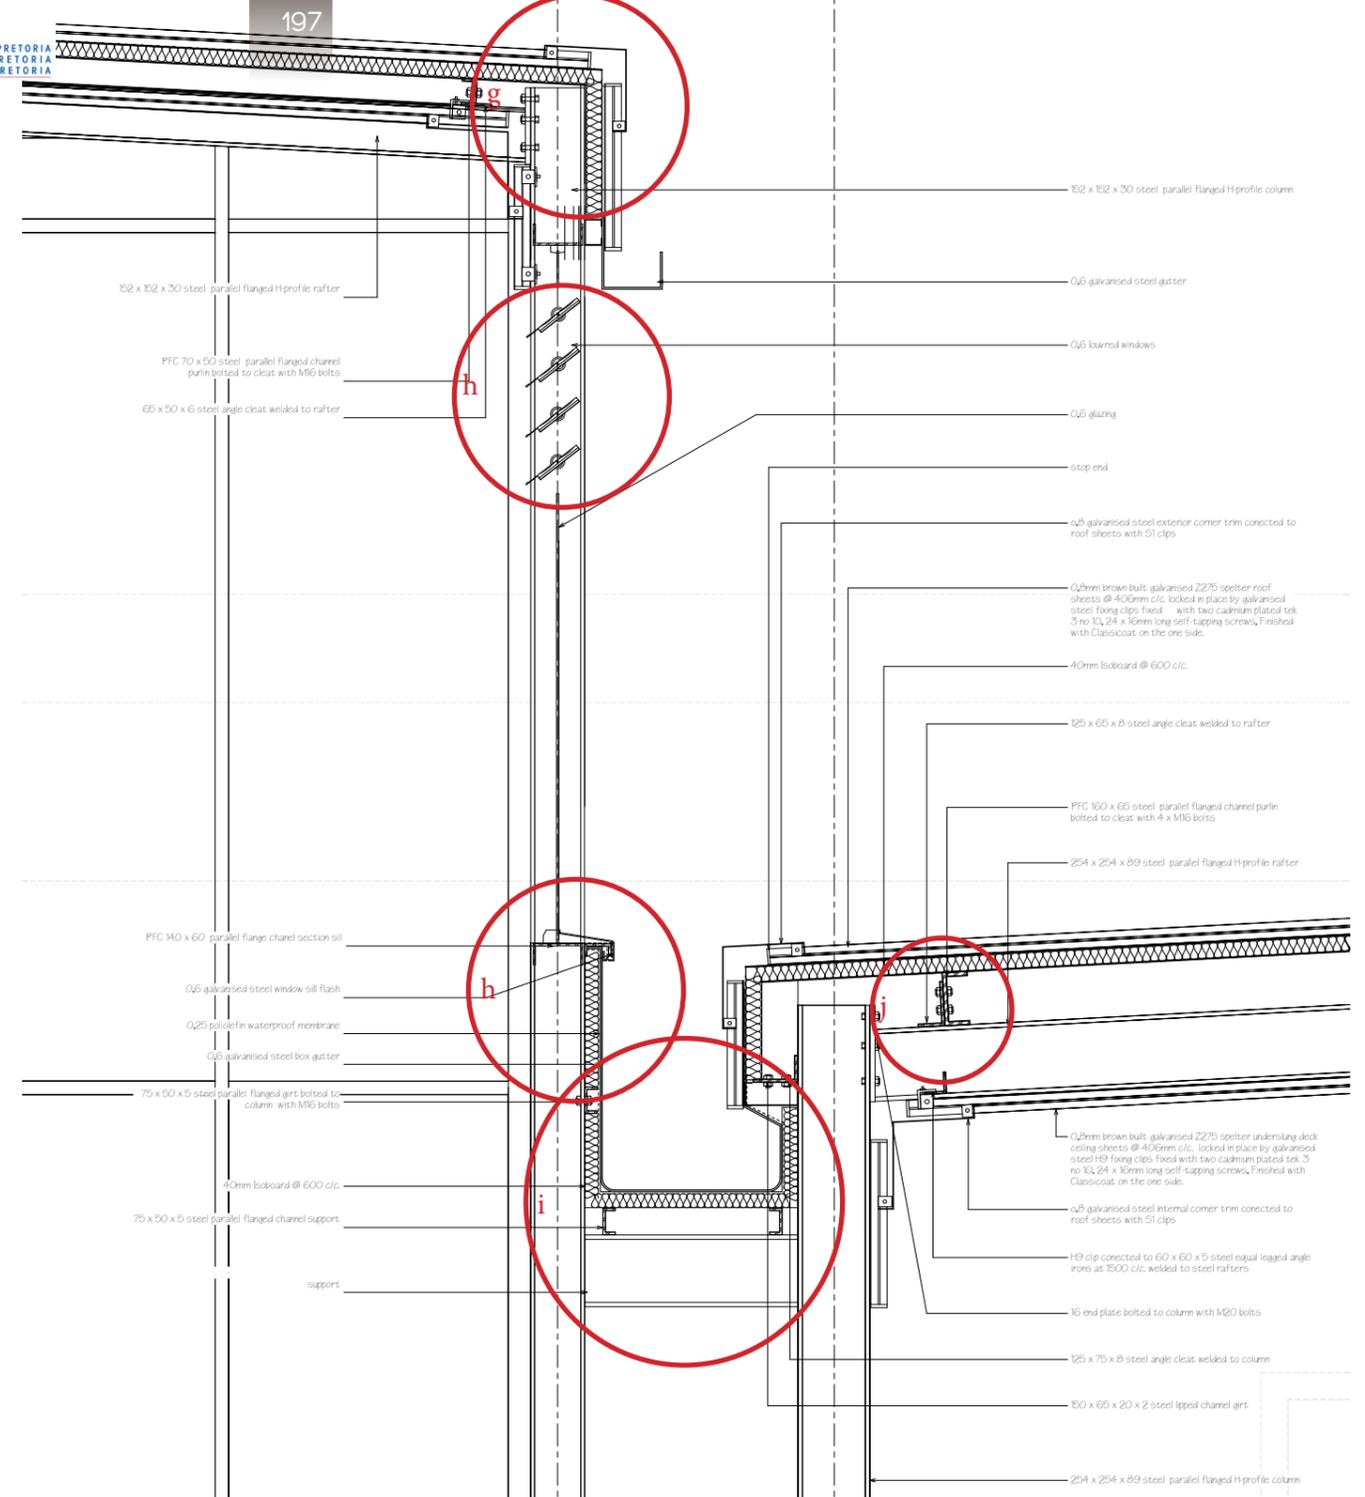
Detail 2: roof, ceiling and gutter details (Author October 2013)
